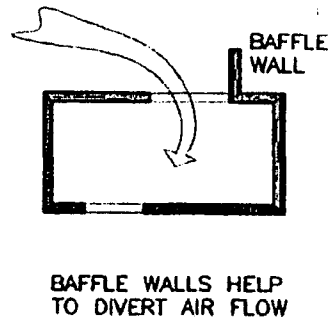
Use of baffle wall for improved cross ventilation (Nayak et al., 1999)
